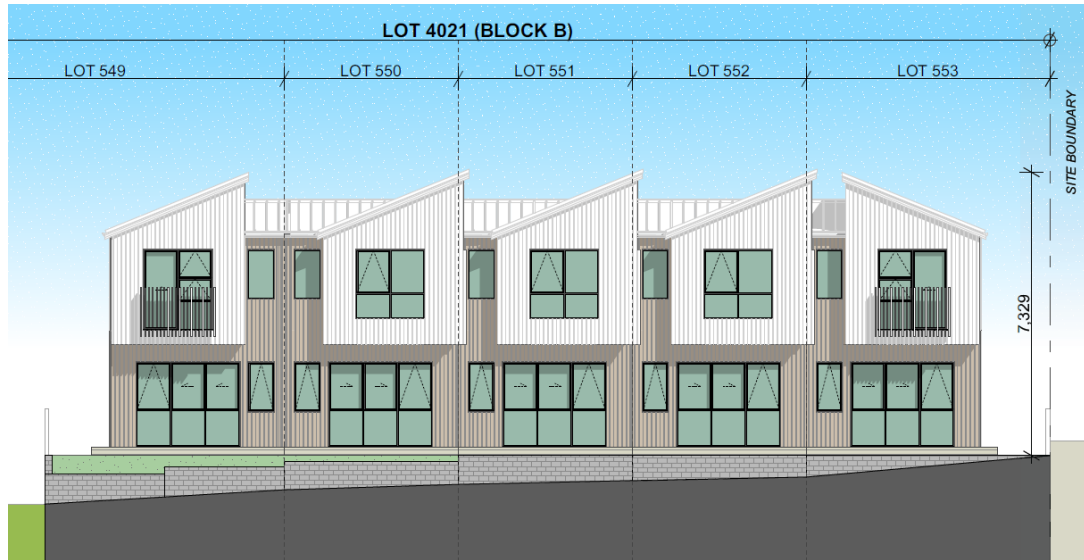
Superlot 4021 Block B Street Elevation (source: Woods)
